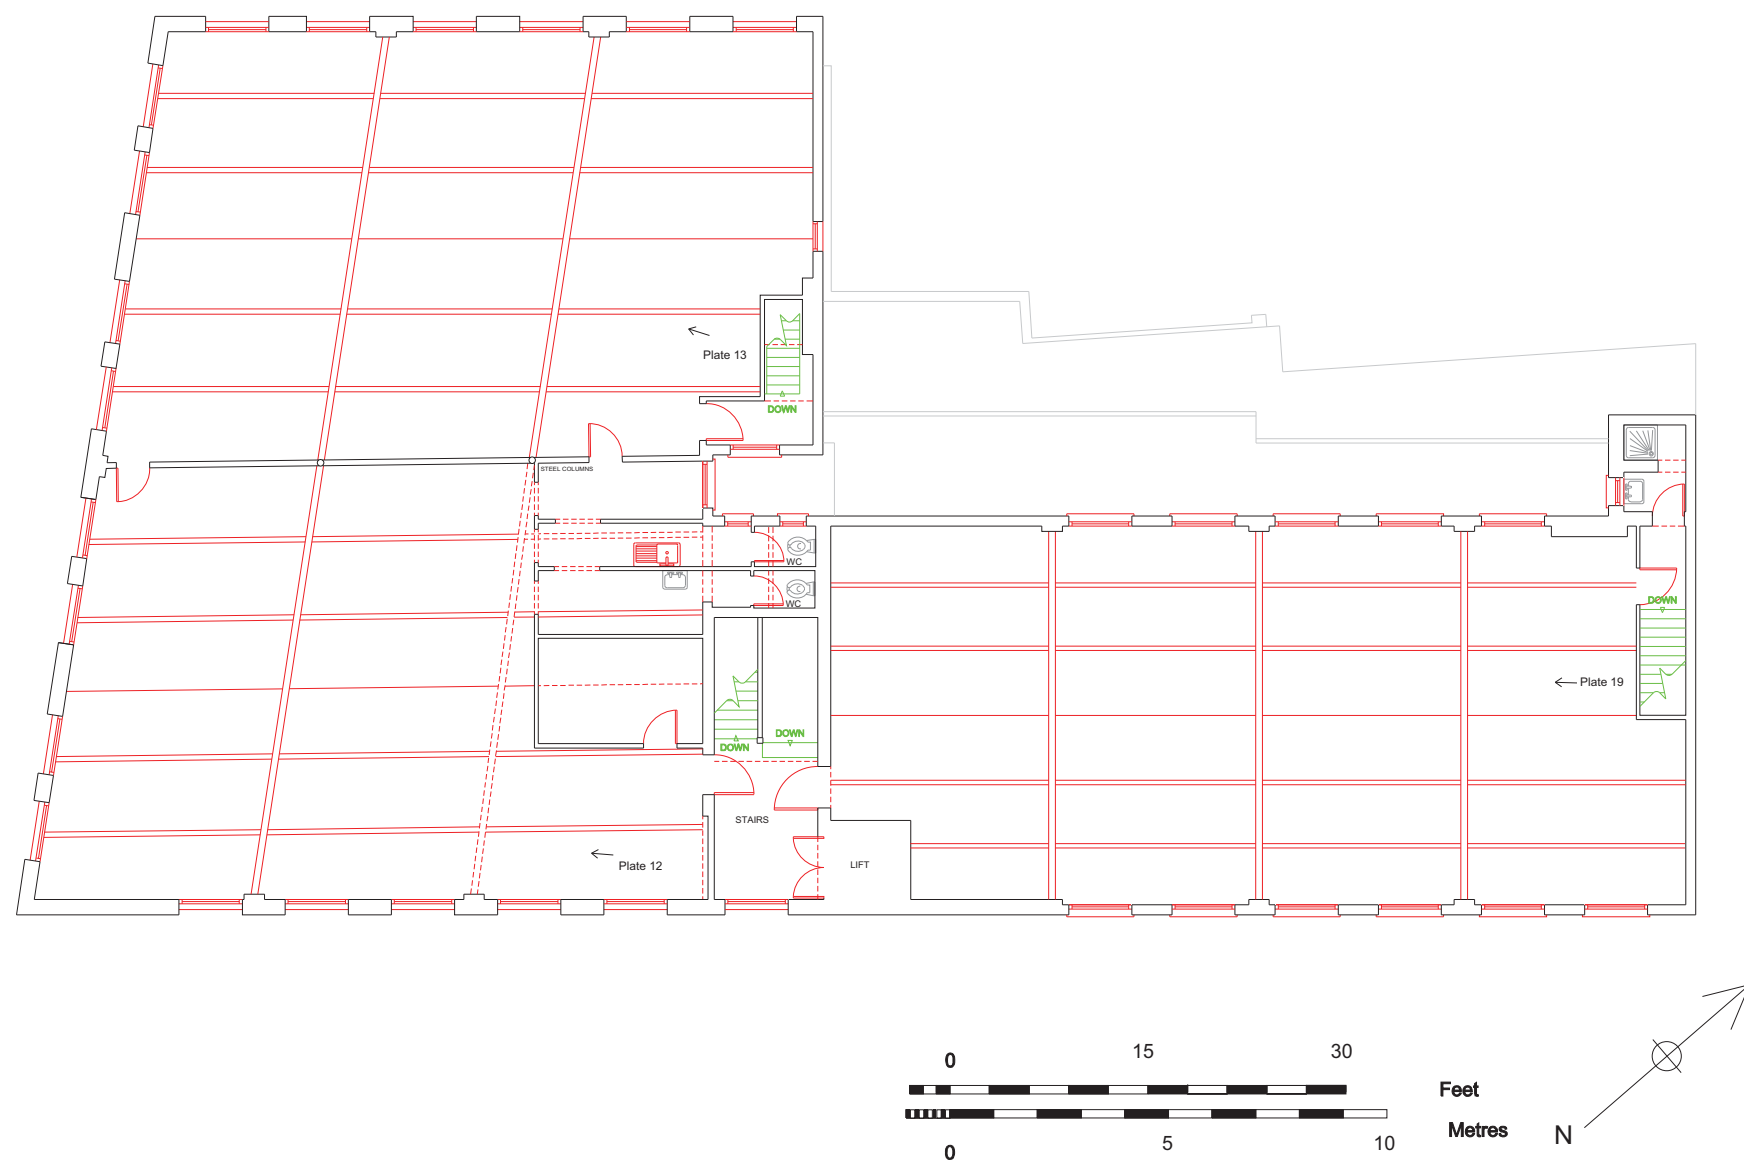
25-27 Bede Street Second Floor Plan (based upon plans supplied by SV Surveyors Ltd)
